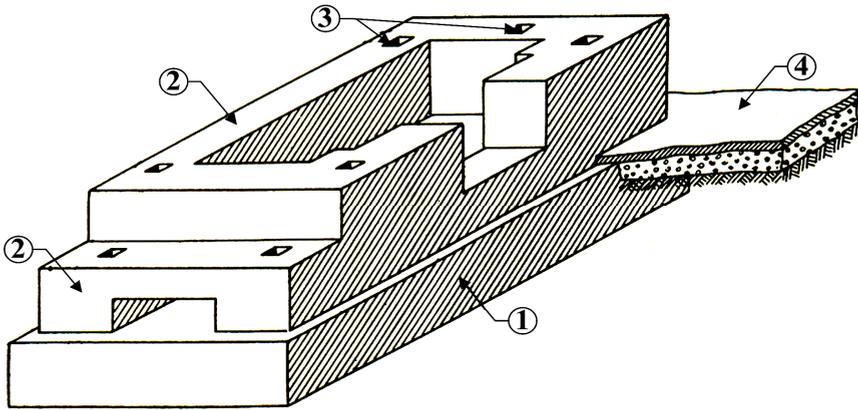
Box foundation for machine (Kral 1973); 1 – bottom slab of the foundation, 2 – upper part of the box, 3 – anchor holes for fixing the machine, 4 – lower slab of the foundation
